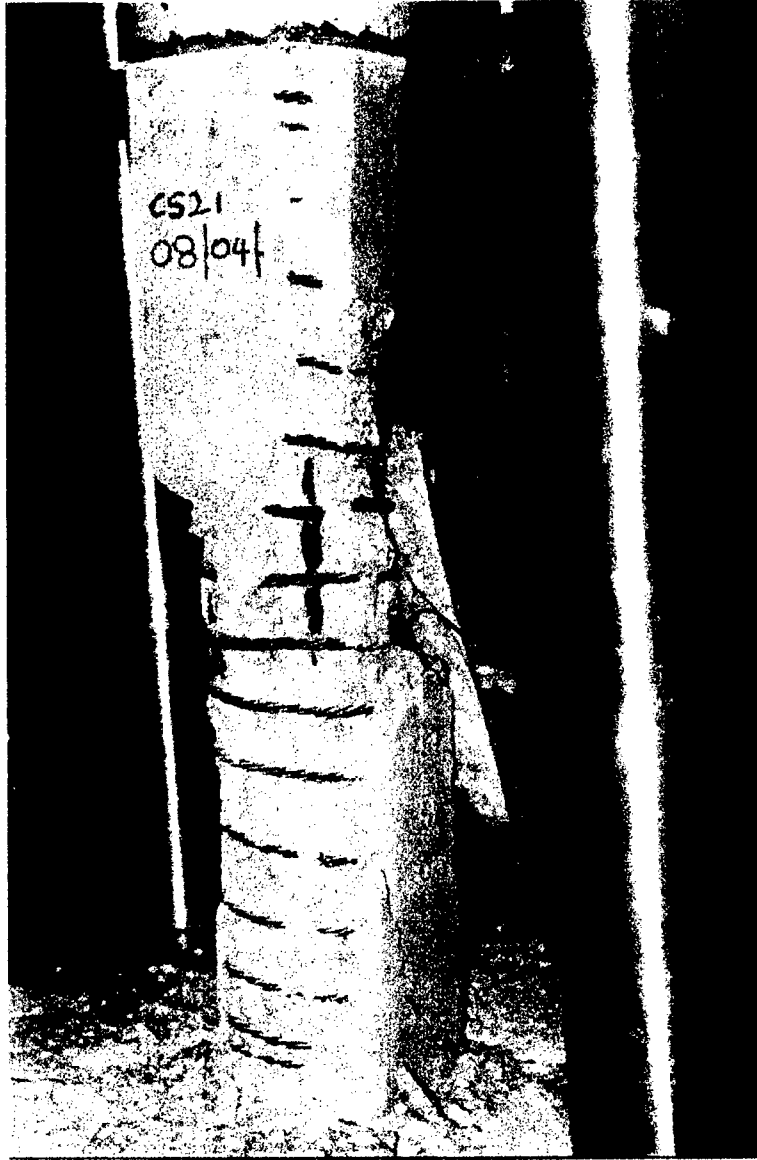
Progressive concrete cover spalling in column specimen CS21
